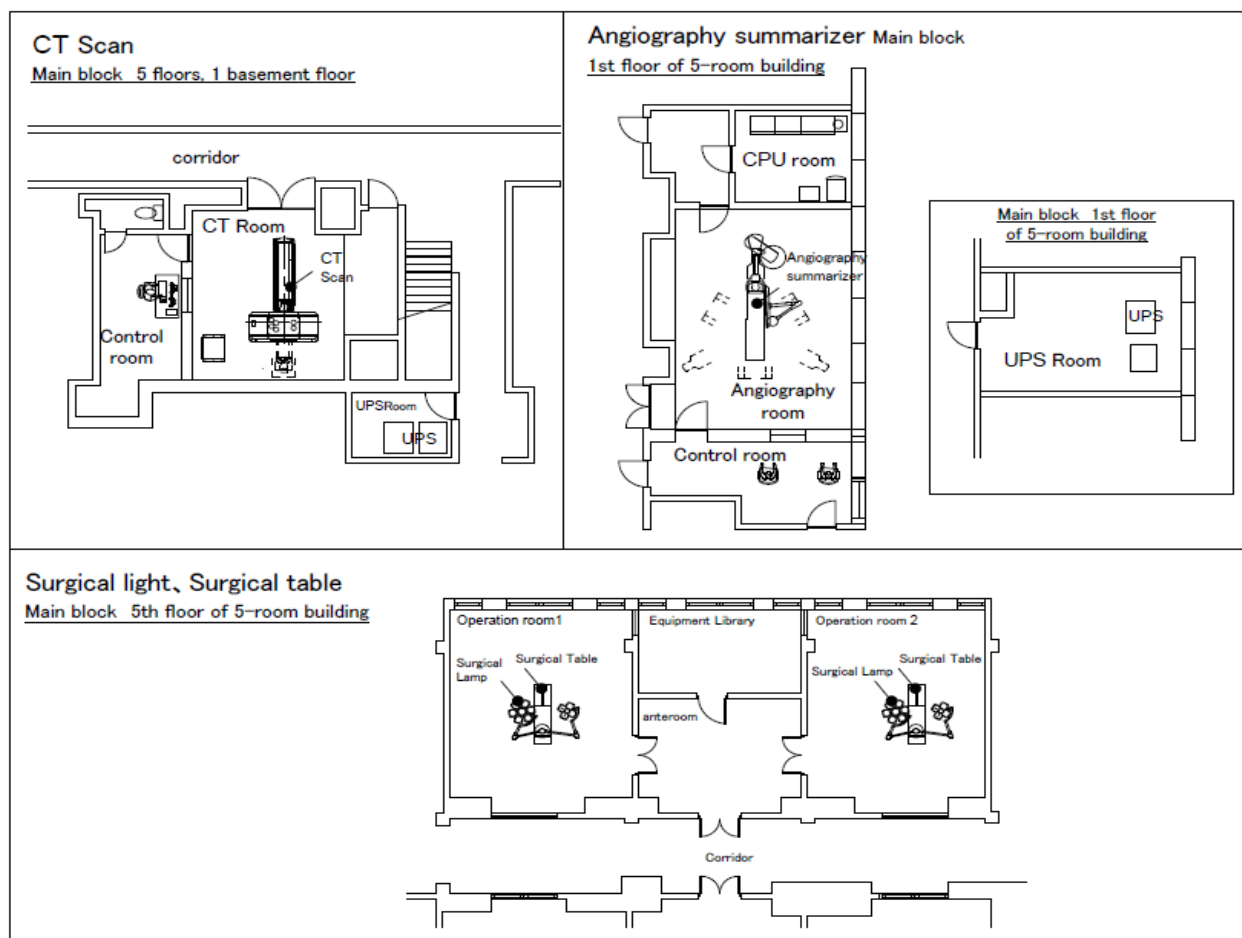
Floor Plan and Equipment Layout (SRIHSOT)
